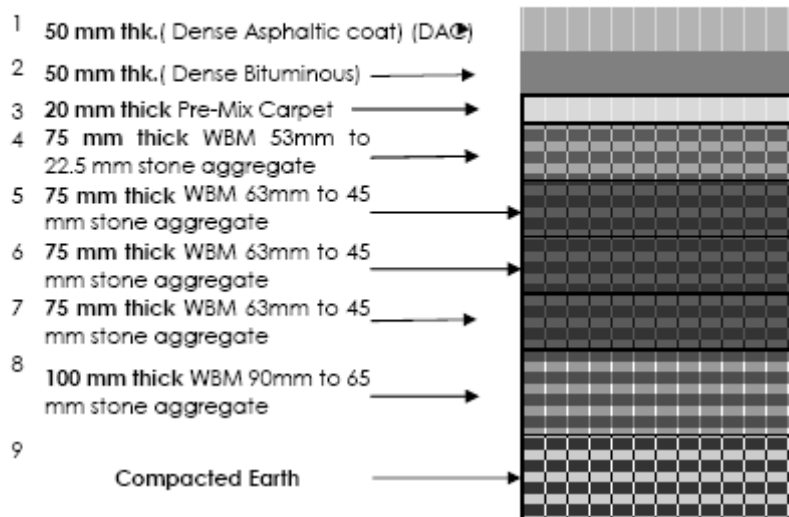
of 4 30' - 00" FEET WIDE ROAD (ROAD TYPE II)
